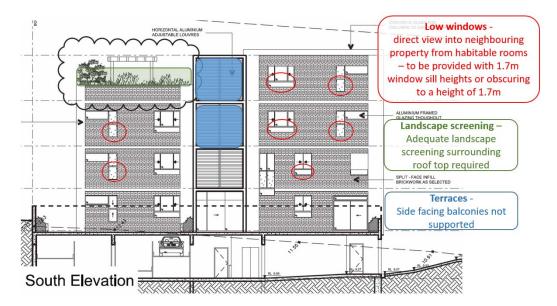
Extract of South Elevation illustrating overlooking mitigating measures (source: North Elevation plan prepared by CMT architects, dated 13 November 2015, adapted by CPS)
